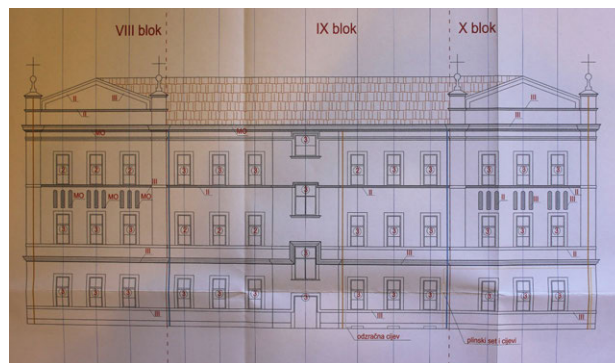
The Convent of Saint Bonaventure, Visoko: elevation view from the northeast, segment of the project for façade reconstruction done by team of authors led by Merima Kapetanović (3N Kuća)
